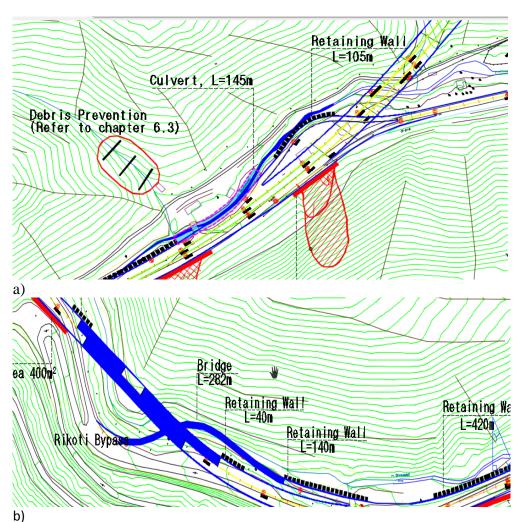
Connection to existing road – Alternatives (A2-1, A3-1, A4-1)
